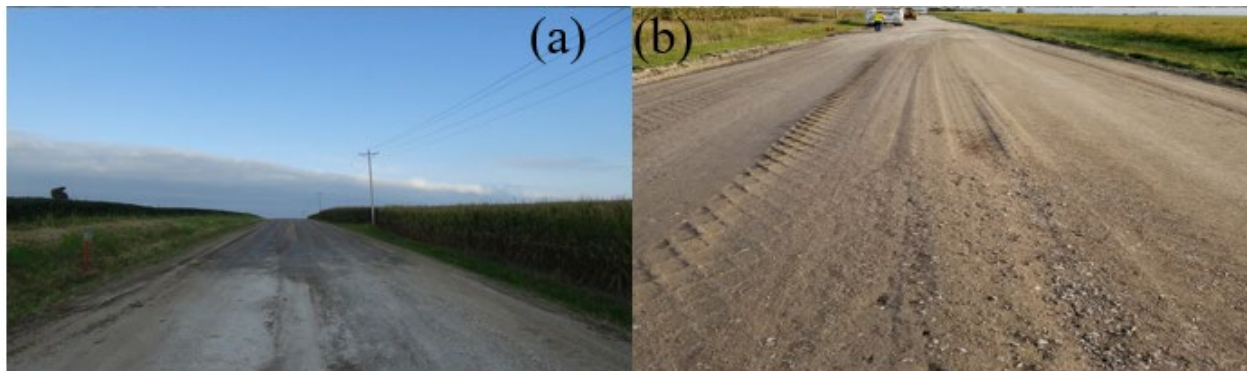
Claycrete sections at end of construction: (a) Washington and (b) Hamilton County
